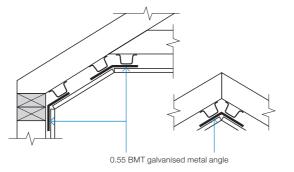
GIB® RONDO® METAL CEILING BATTENS WITH CORNER ANGLES
